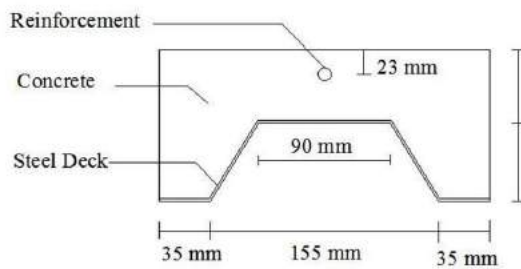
Dimensions of Slab Section of Continuous Composite Slab
